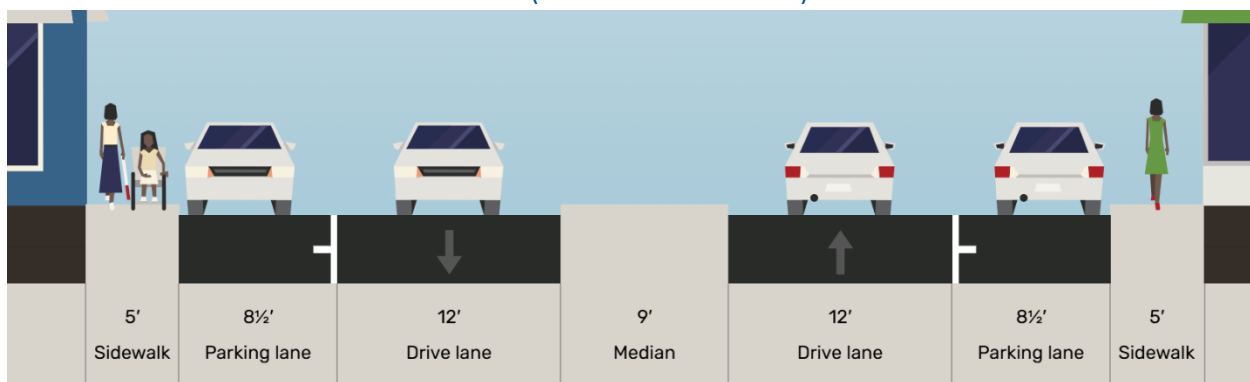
EXISTING TYPICAL SECTION (10TH ST TO 9TH ST)
